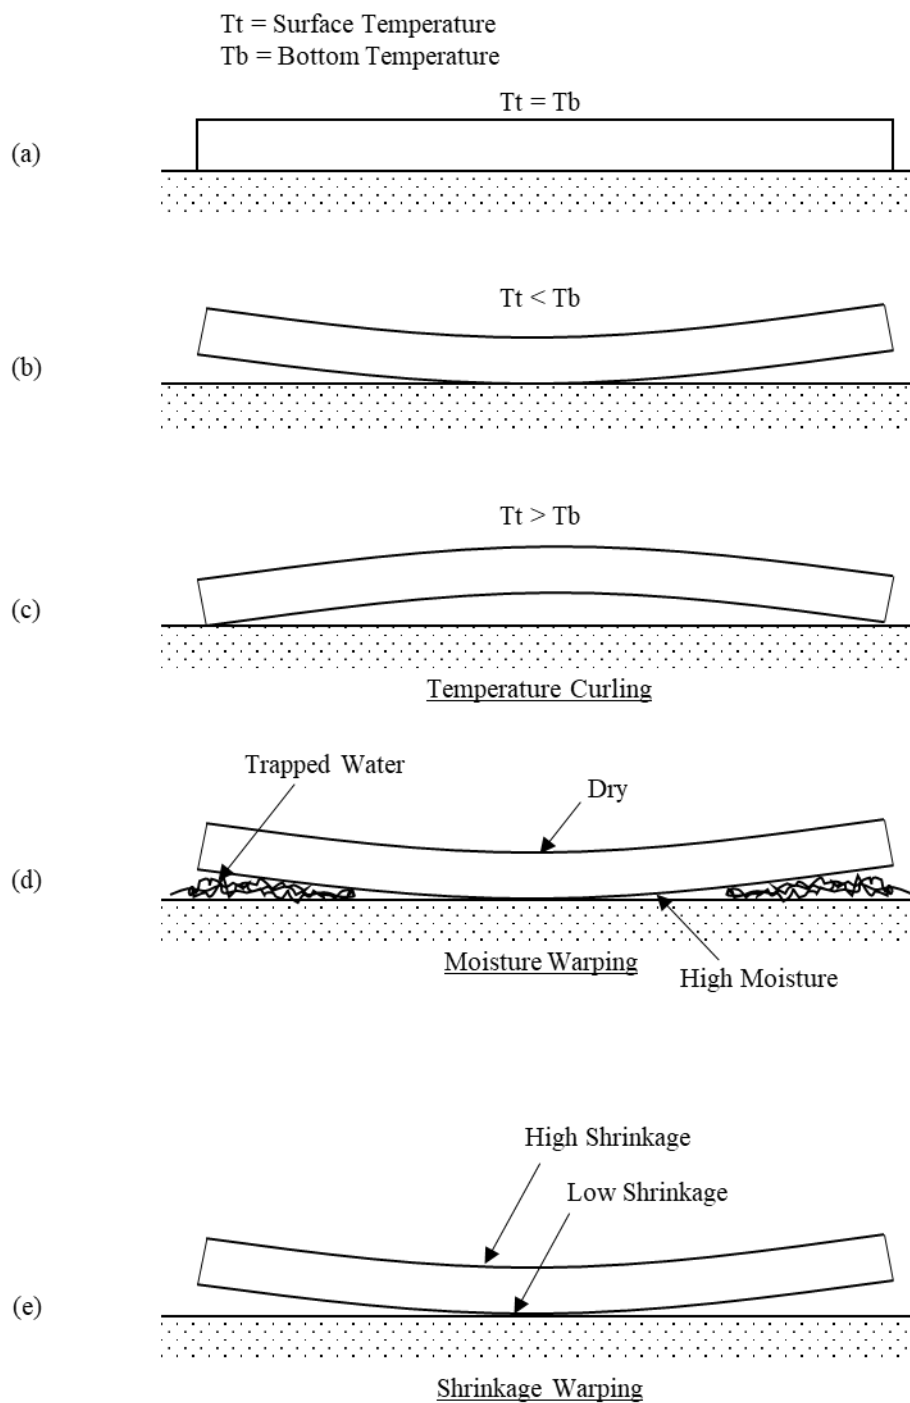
The curling and warping of concrete pavement slabs (adapted from Armaghani et al., 1987)
